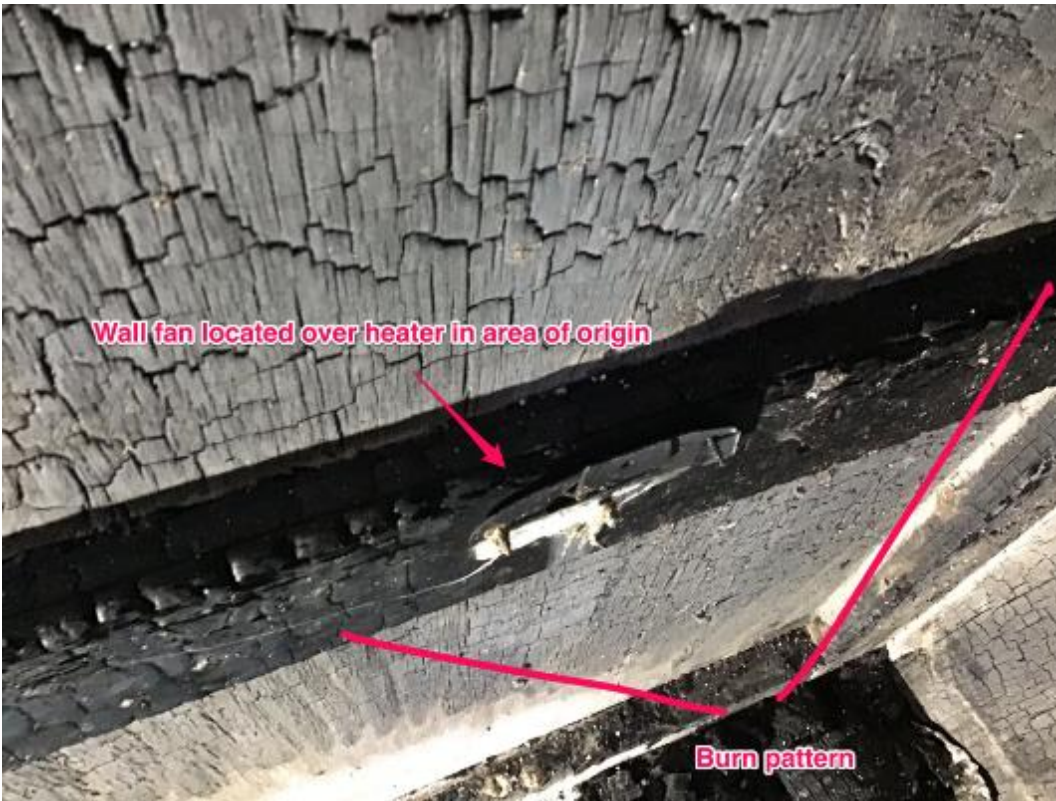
Burn pattern around location of wall mounted fan (photo provided by Fire/Rescue)
